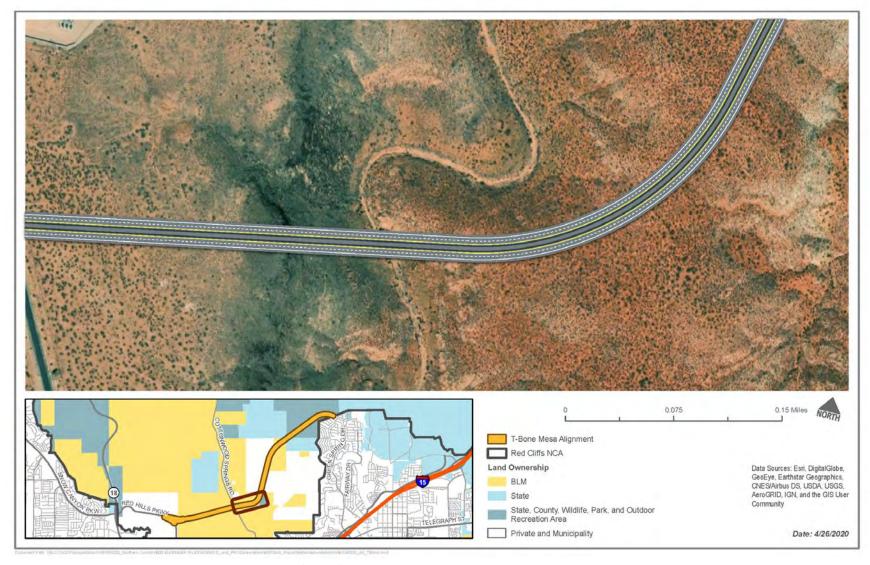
T-Bone Mesa Alignment Plan View (4 of 8)
